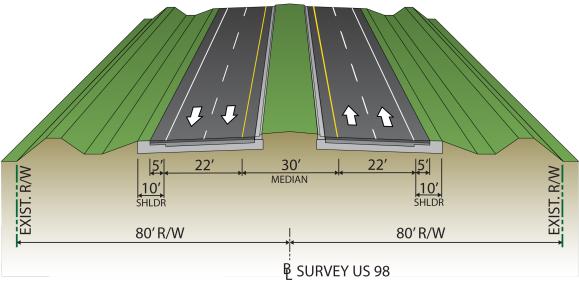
Proposed US 98 C2 (Rural) Typical Section
